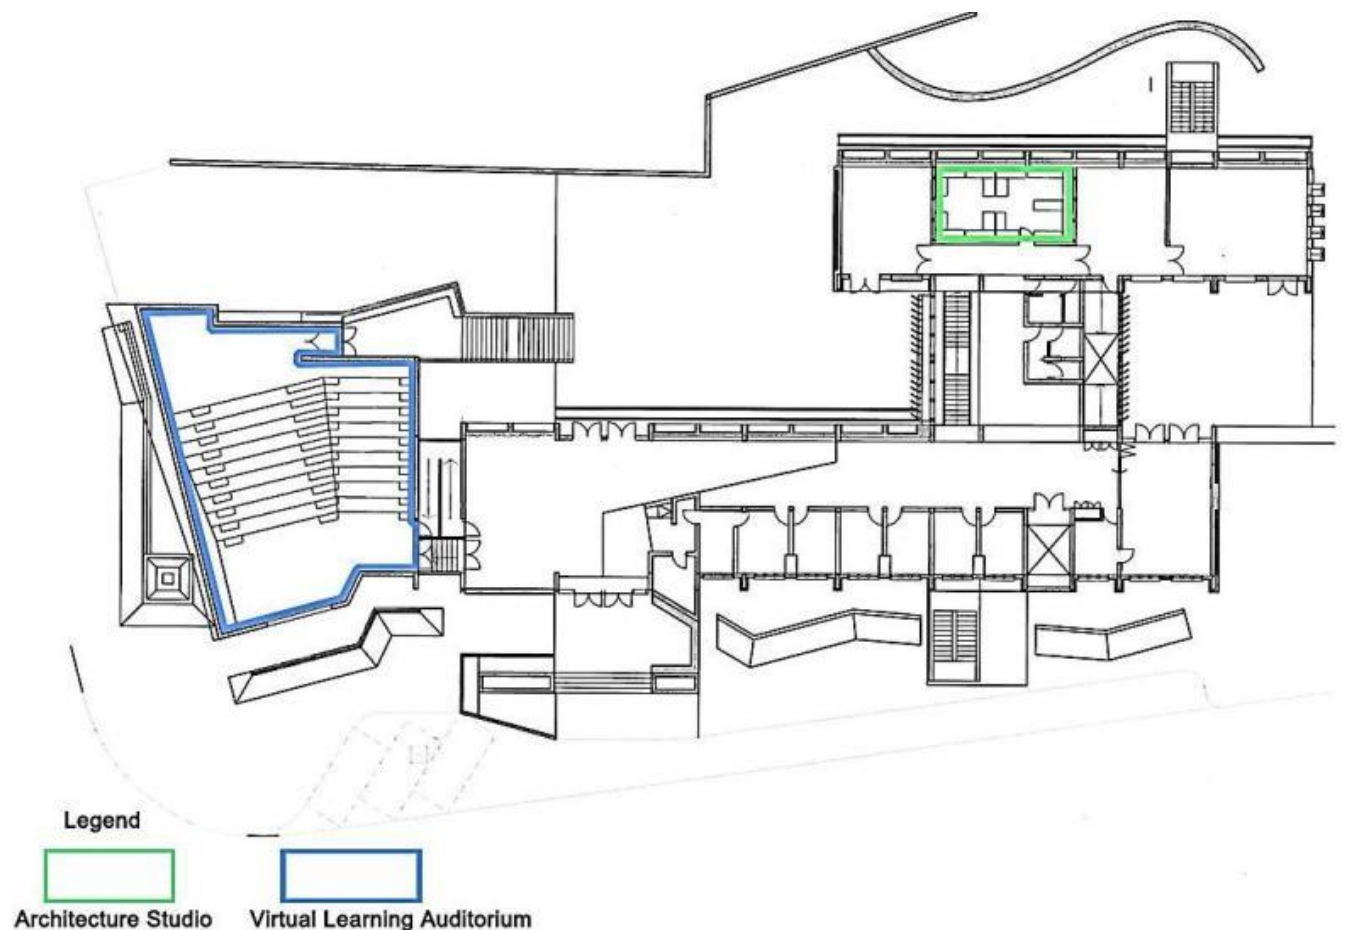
Ground Floor - TUT Department of Architecture, Scale: 1:250 (Luckan 2016)
